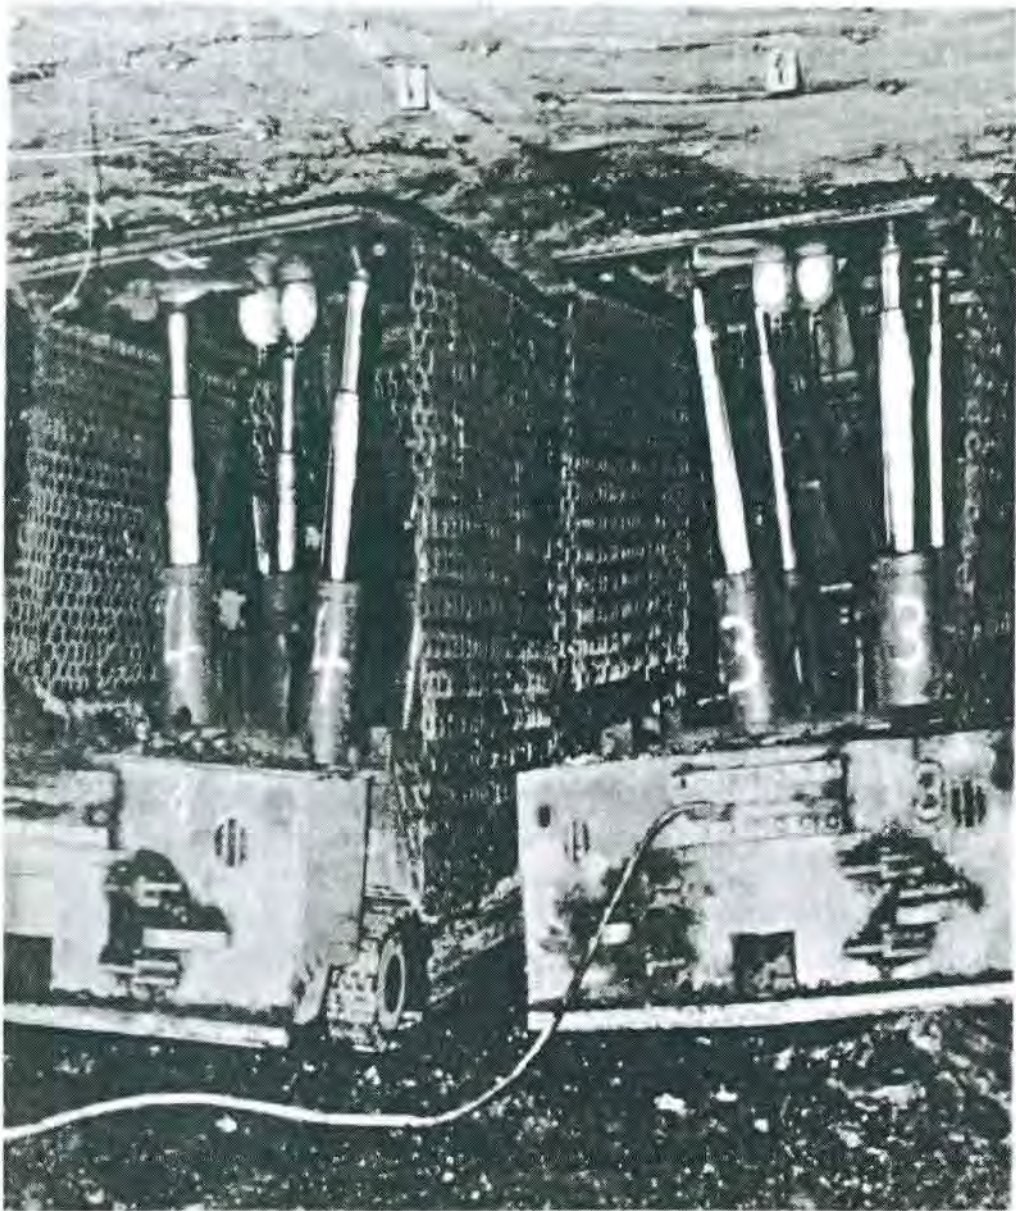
Mobile Roof Supports (MRS) for retreat mining
